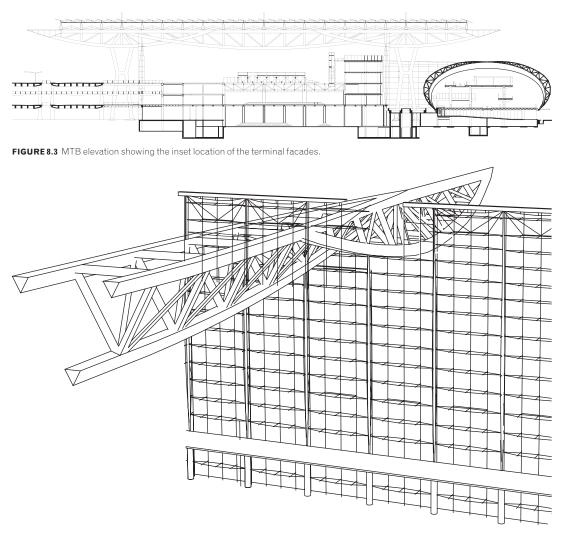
Interface of a supertruss with the terminal facade.
